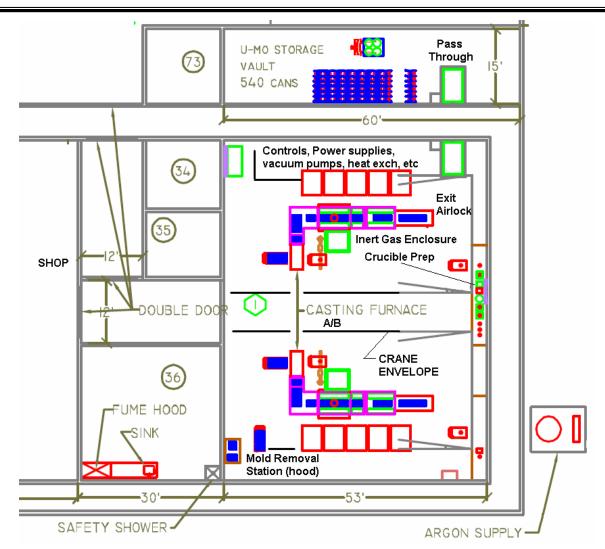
ALLOY CASTING AREA (PLAN)
